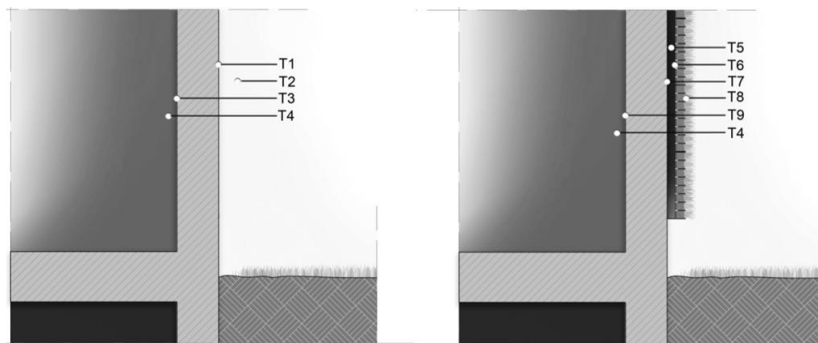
PT100 probes positioning. Bare wall section(left), covered wall section (right).
